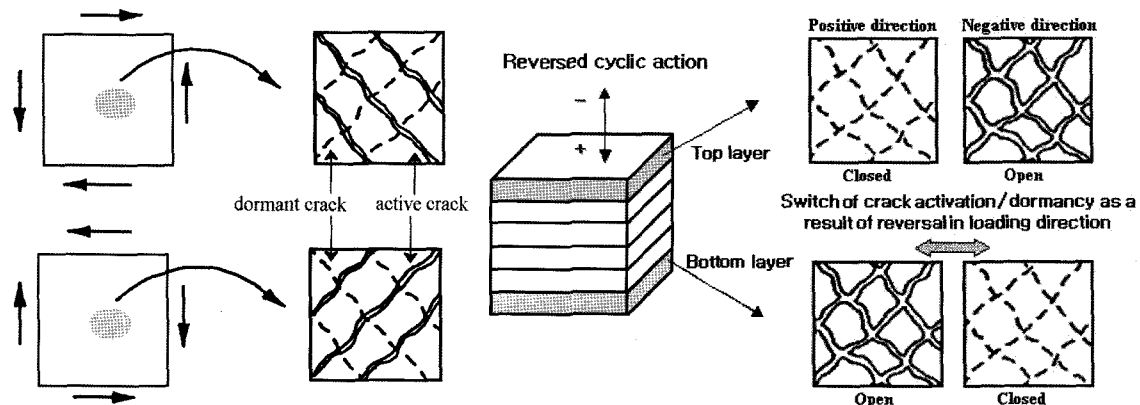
Crack configuration in panel and shell elements under reversed cyclic loading
